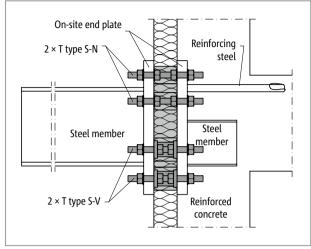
Schöck Isokorb® T Type S-N and T type S-V modules for connection of steel structure to reinforced concrete frame
